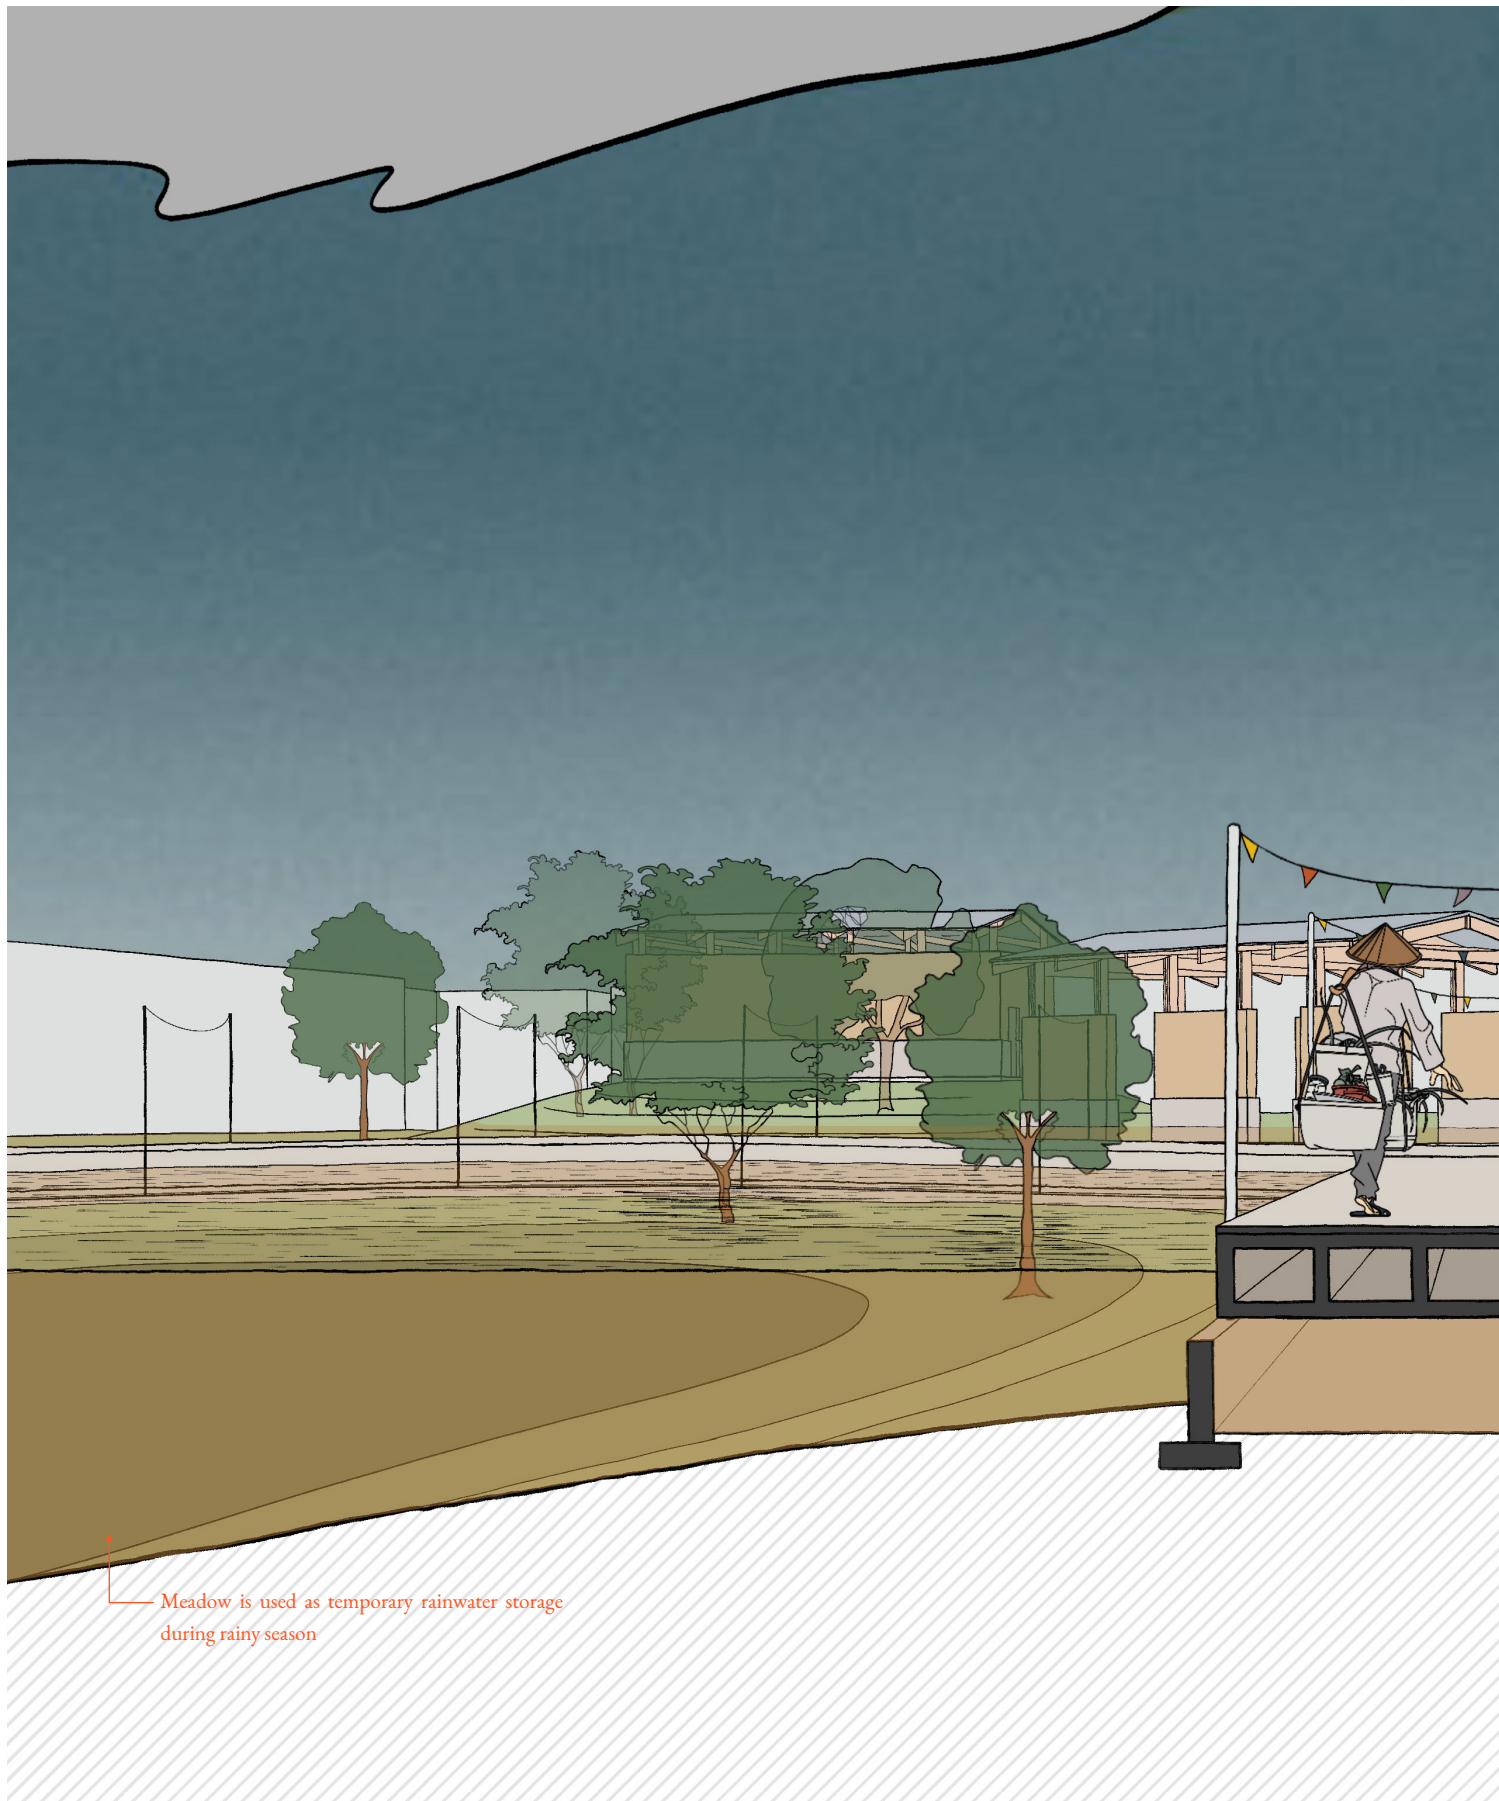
Section of amphibious walkway in flood adaptive public space in flood condition. (in Site 2 and 3)
